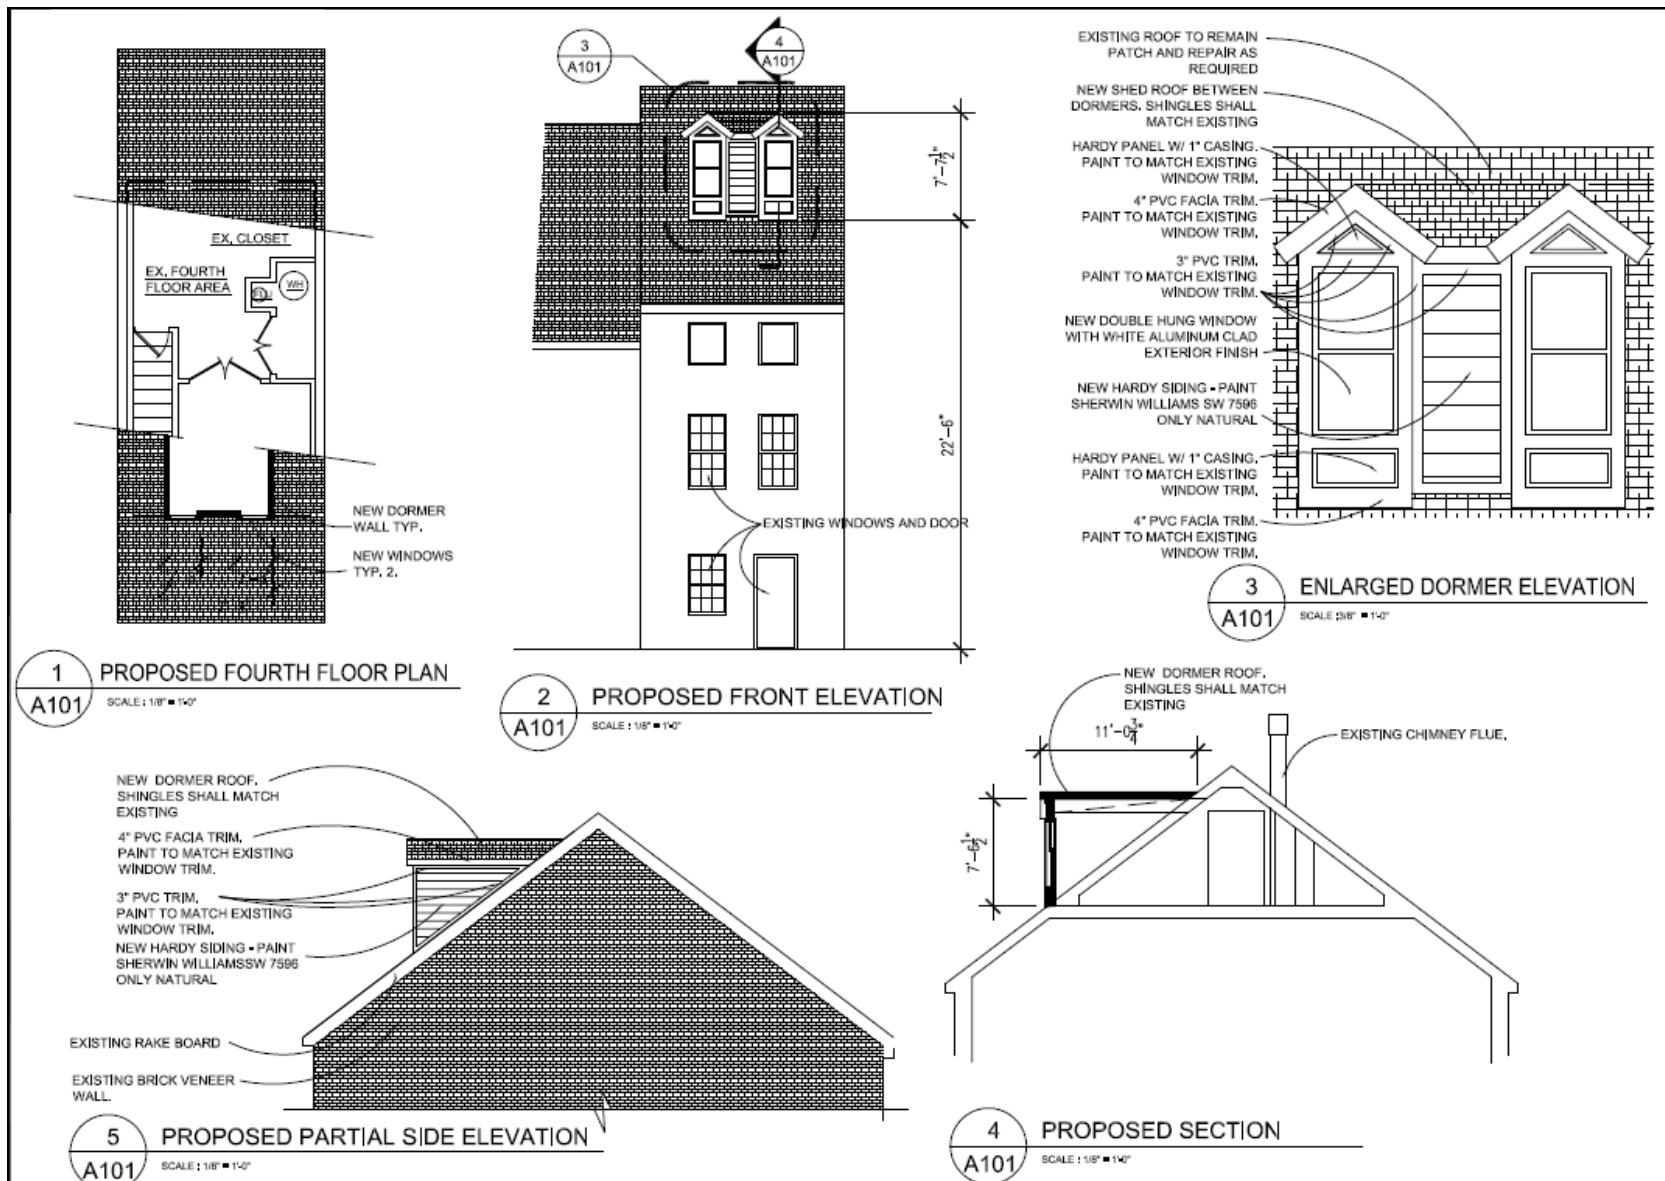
Proposed dormer addition: plan, elevation, detail, side elevation and section.
